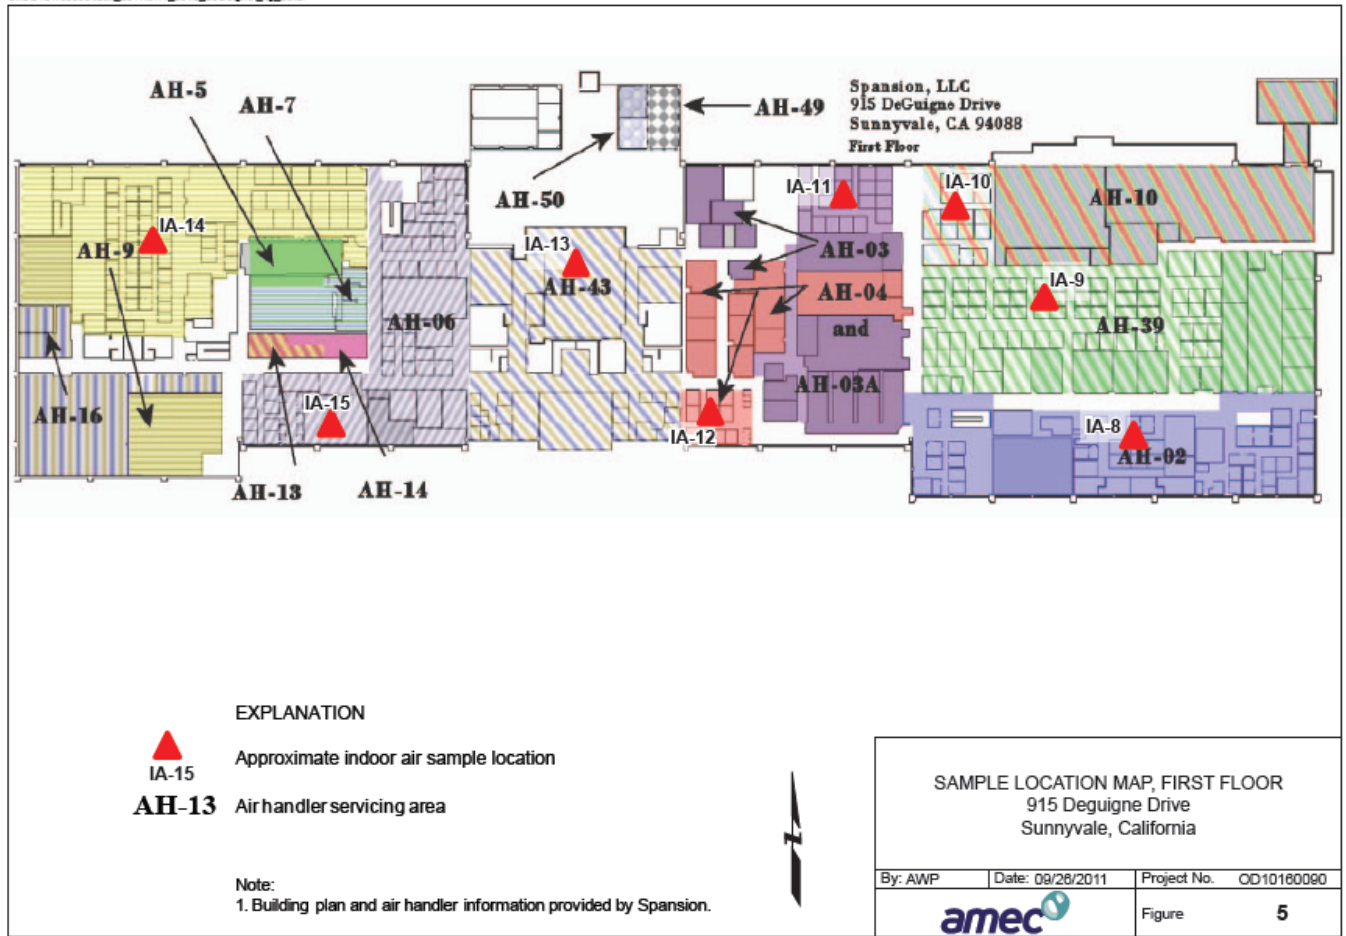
915 DeGuigne building first floor indoor air testing locations
